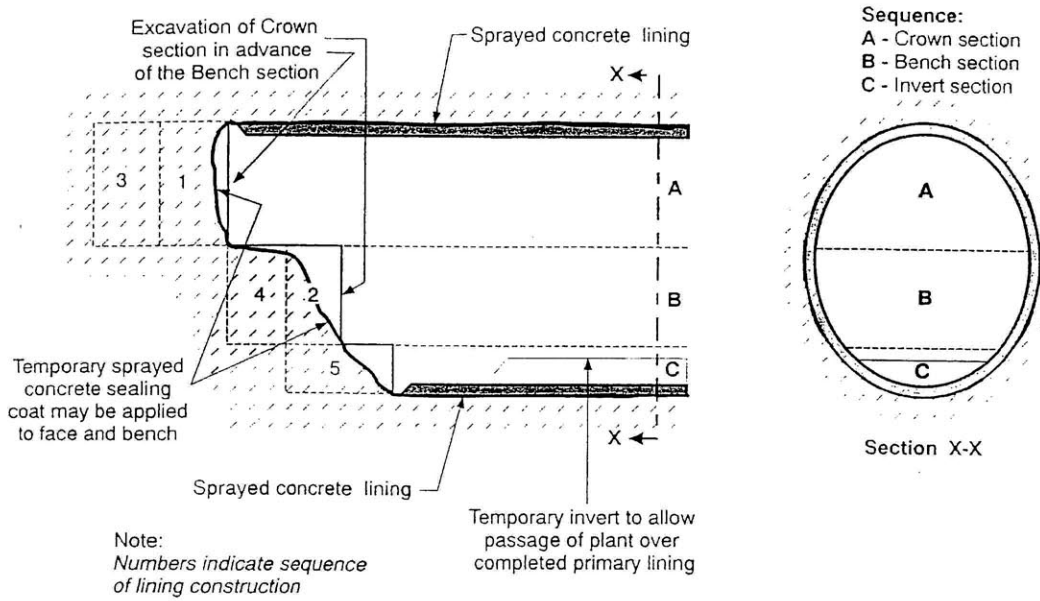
Tunnel excavated in 3 partial faces (HSE, 1996)
